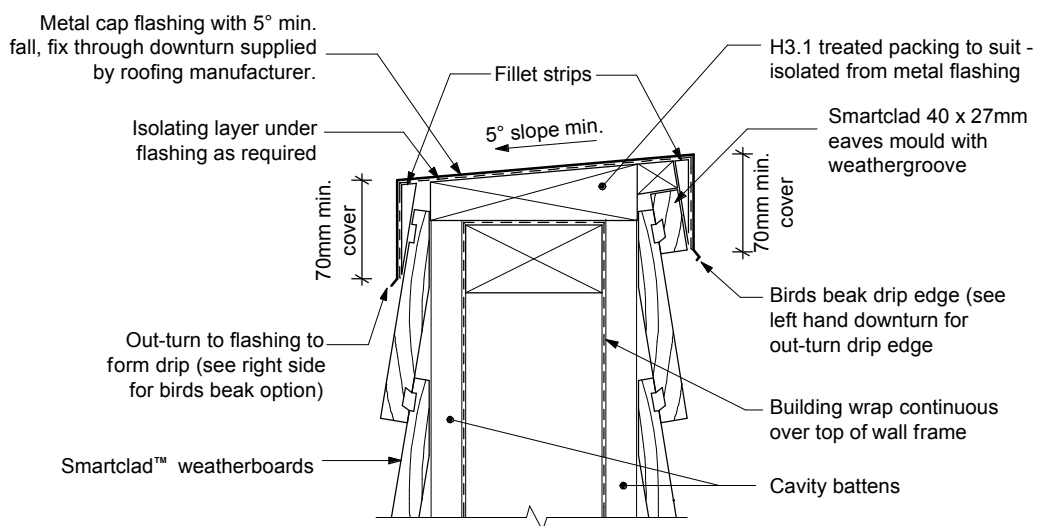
Cavity fixed - Parapet/Balustrade - Wall junction - Plan View
